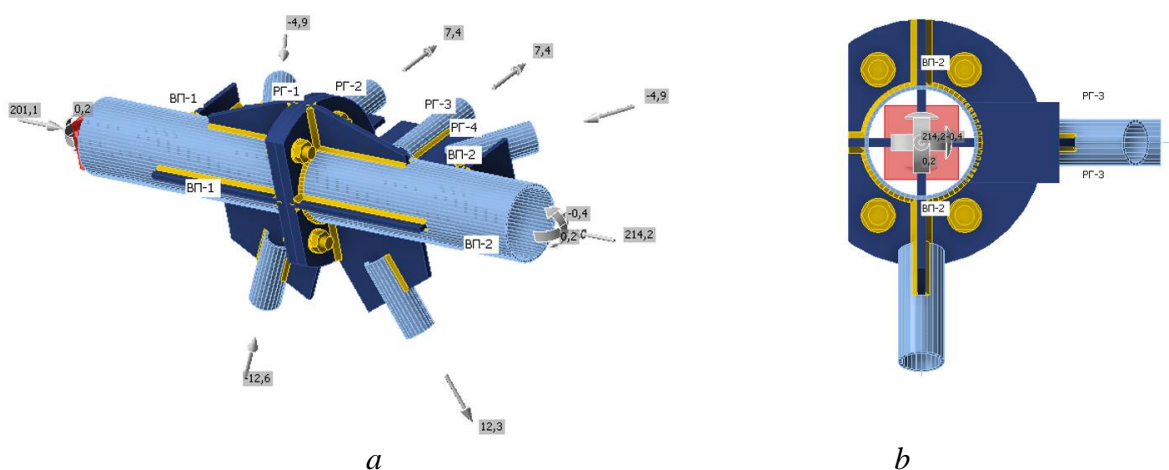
General view of Model 1 of the analysed joint with bolted connection and welds (a). Cross-section of the flange connection (b).
